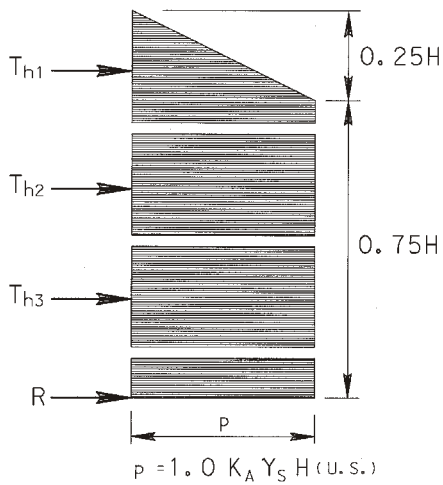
1 - Apparent Earth Pressure Distribution for Anchored Walls Constructed from the top down in Soft to Medium-Stiff Cohesive Soils
